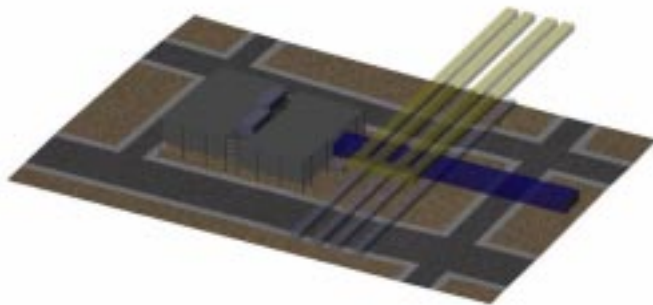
Model of platform zones, garage, core, & bridge Source: Author
